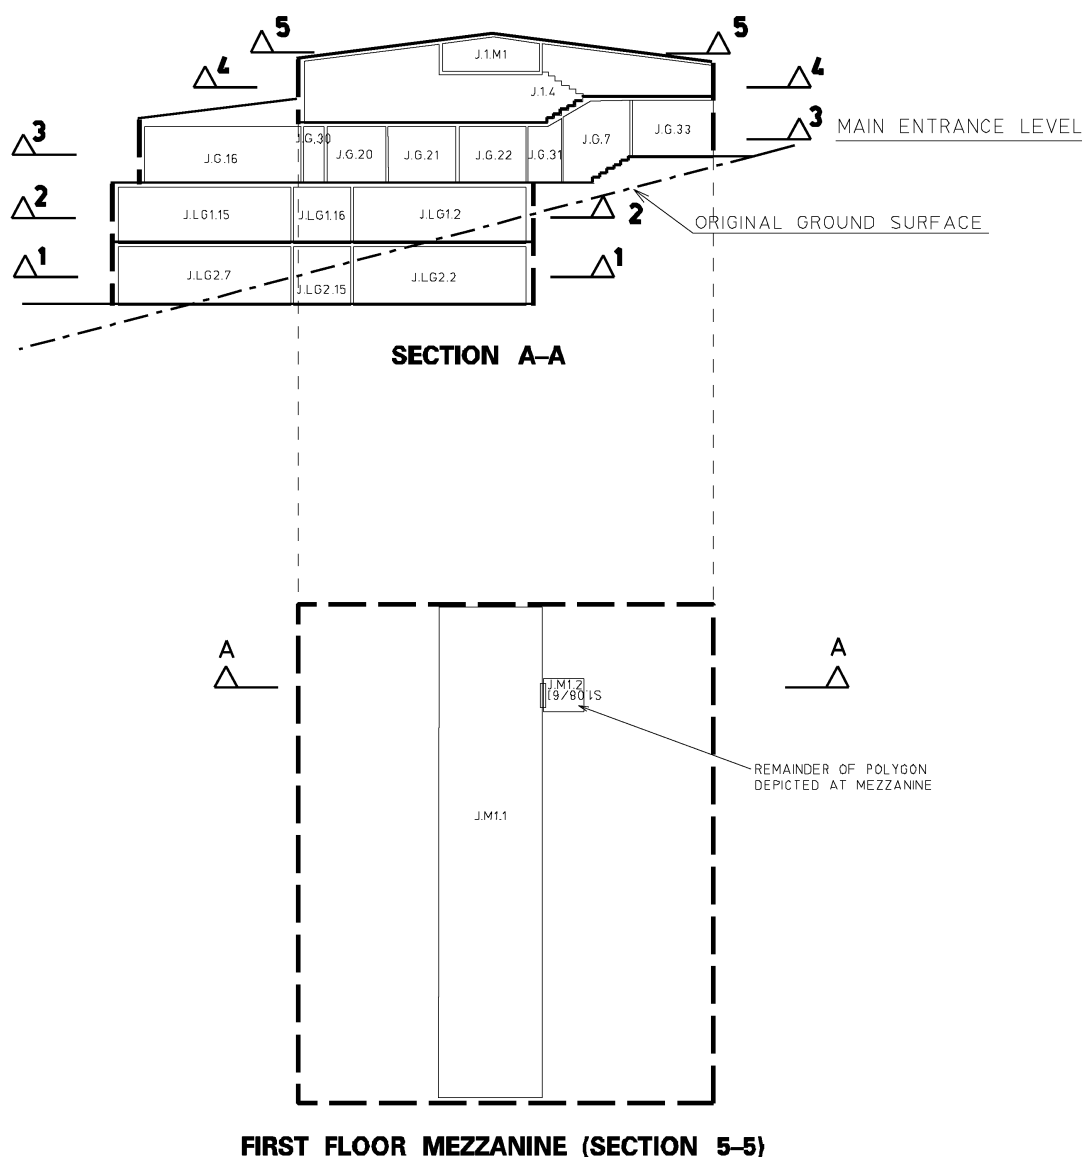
Example drawing of spaces within building outline on sloped site with split levels
